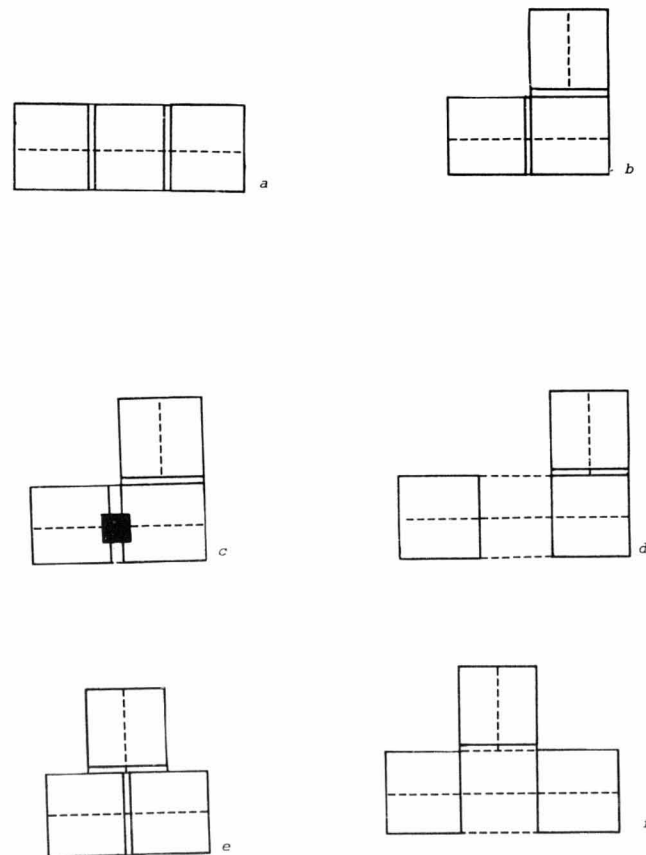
More complex floor plans: a, linear triple pen; b, ell; c, saddlebag ell; d, dogtrot ell; e, "T"; and f, dogtrot "T" (Jordan, 1978).
